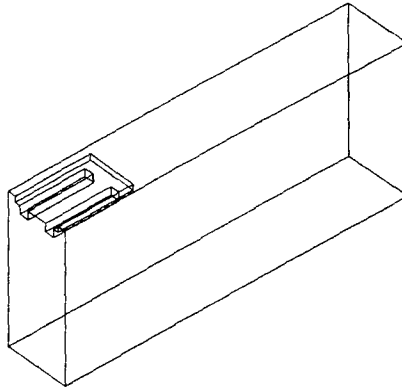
Prefabrication of the glulam for the pre-welded joint.
